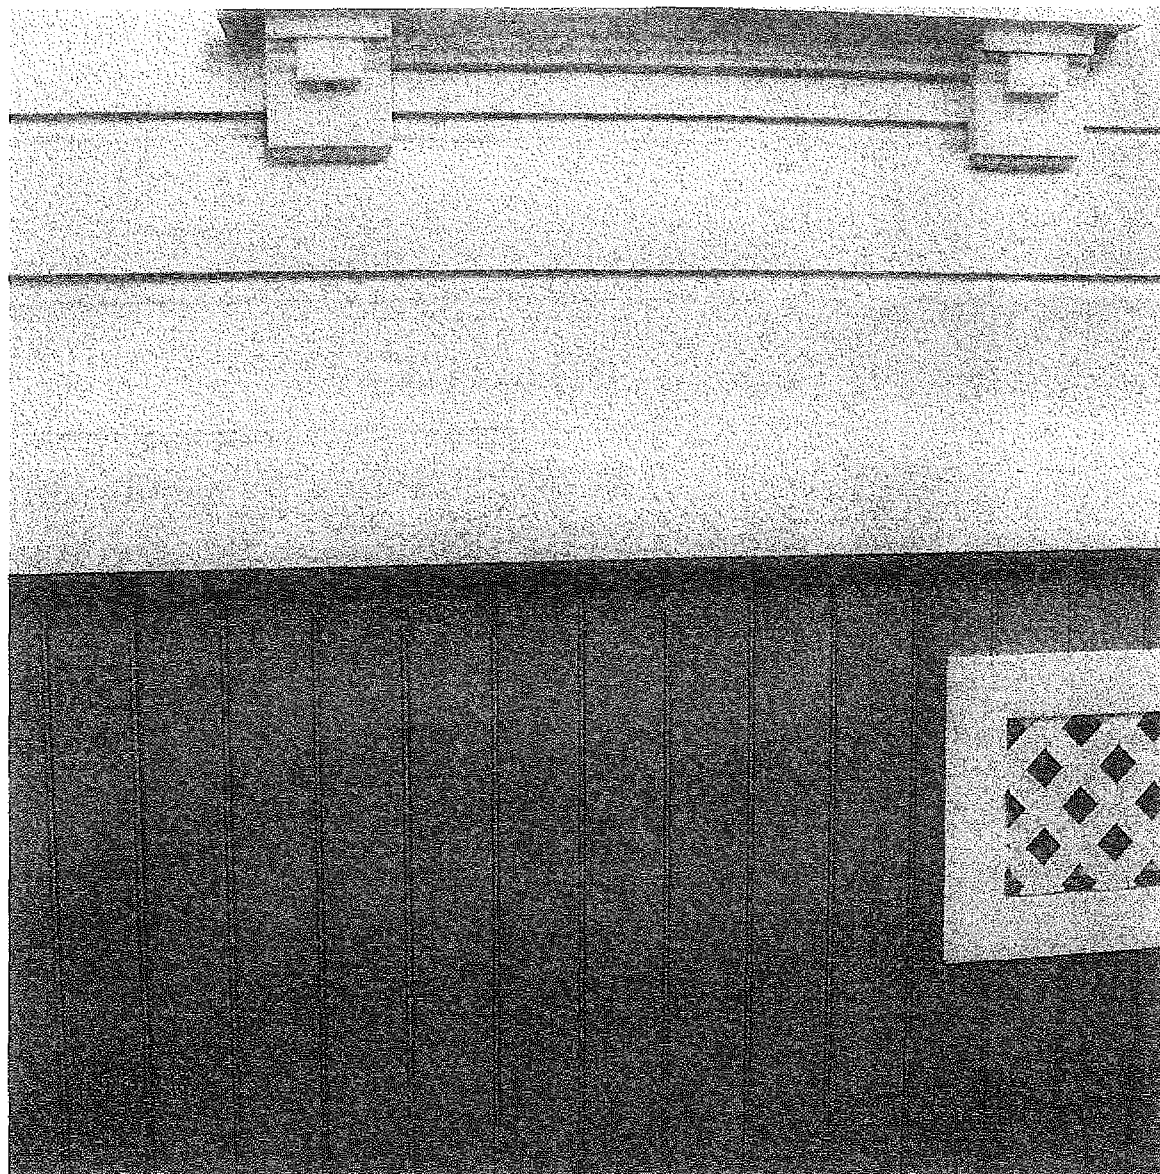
Detail of skirting and siding. Moldings have reddish overtone in this picture, which is not true color.
